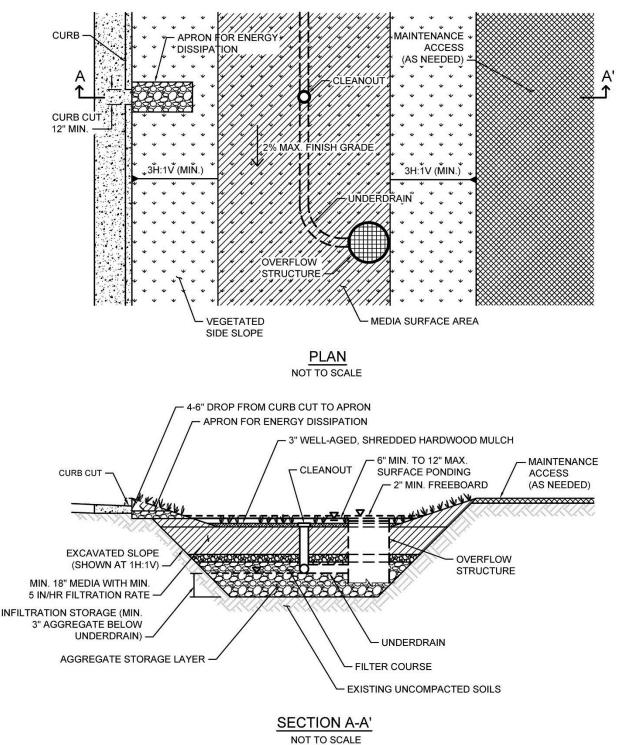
E.12-1: Typical plan and Section view of a Biofiltration with Partial Retention BMP
